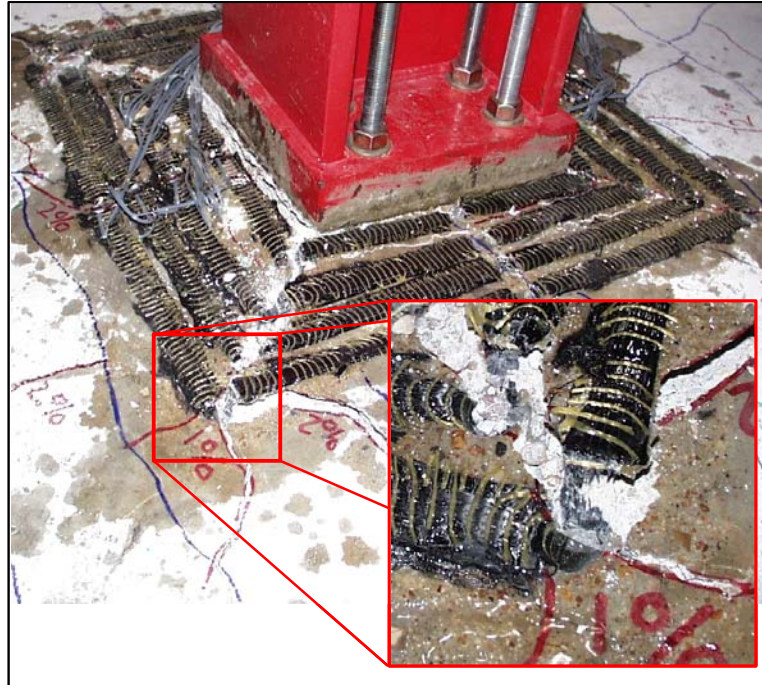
Upgrade Specimen B4-S CFRP Stirrup Rupture
